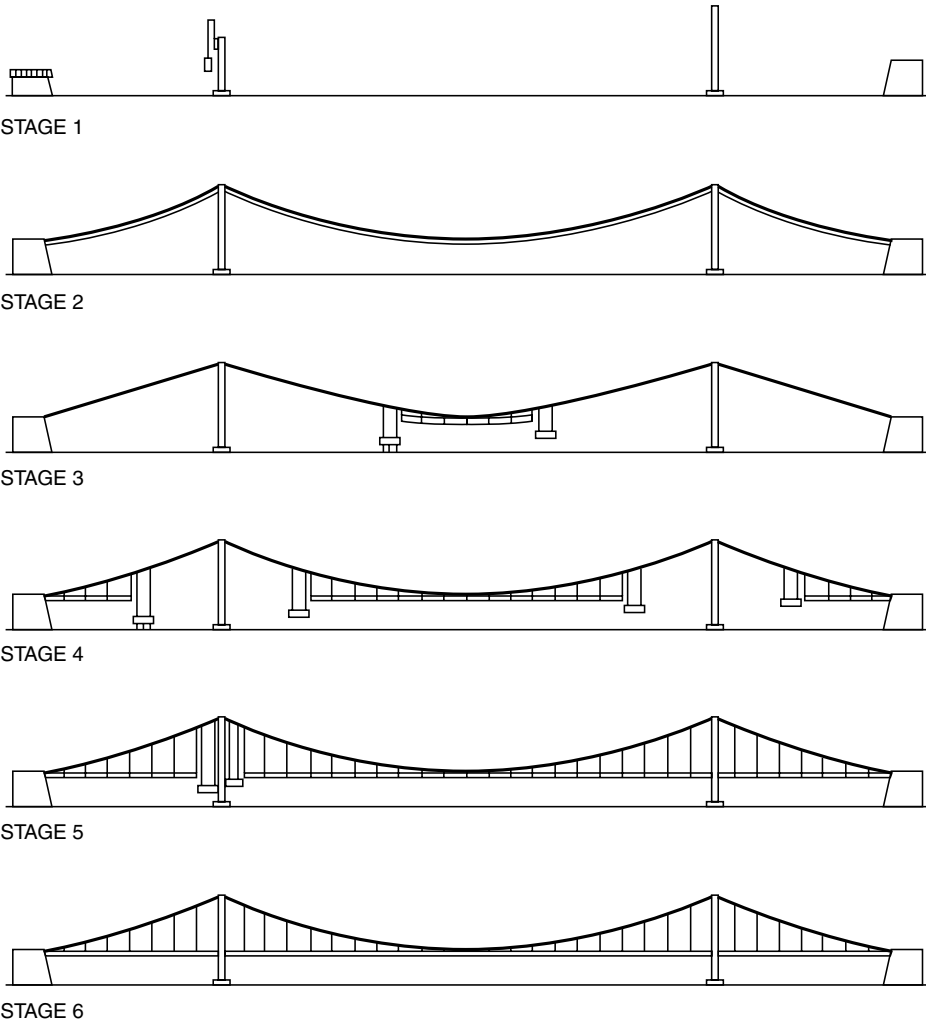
Earth anchored suspension bridge with the deck erected from midspan towards the pylons
